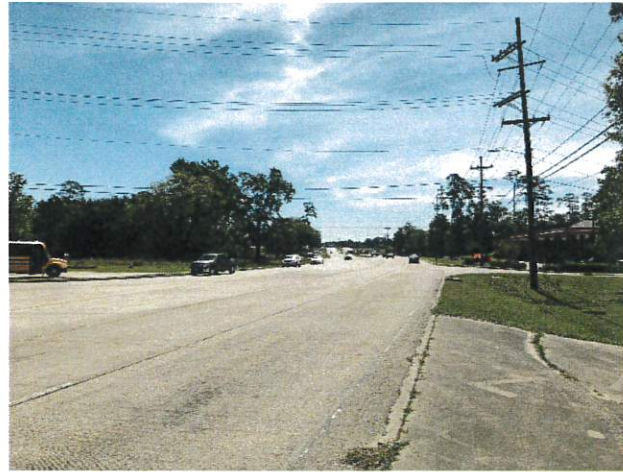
Shortcut Hwy just west of Beth Dr looking east toward I-10
